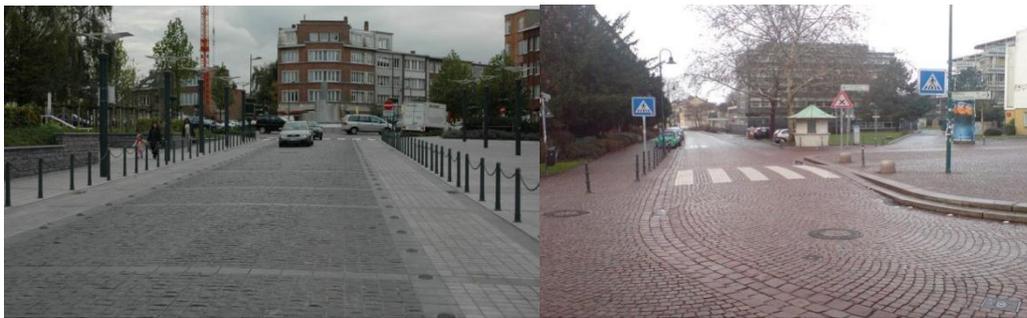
Evere* District road (Belgium) Figure 2-3: Paved roads at Darmstadt (German)
